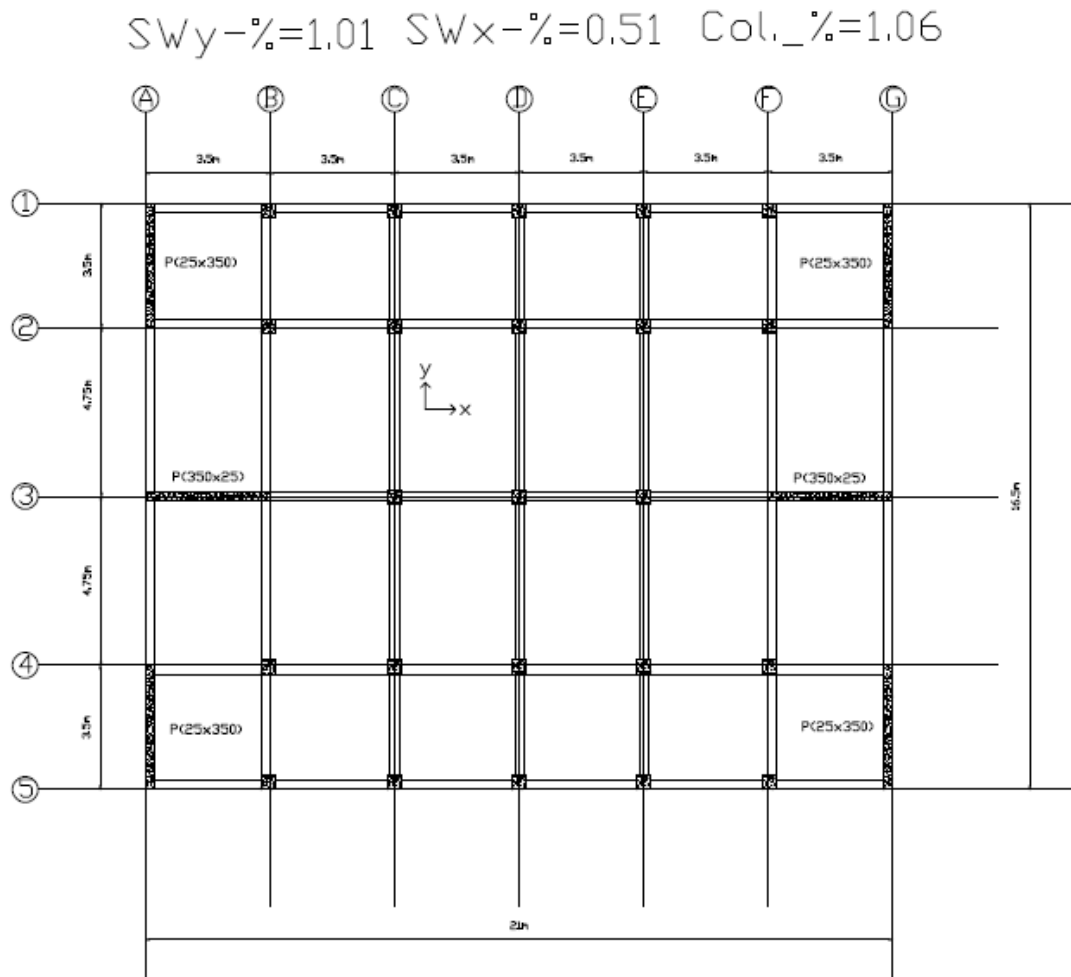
Plan of Model 2 with Wall Area to Floor Area Ratio of 0.5% in X-direction and 1.0% in Y-direction
